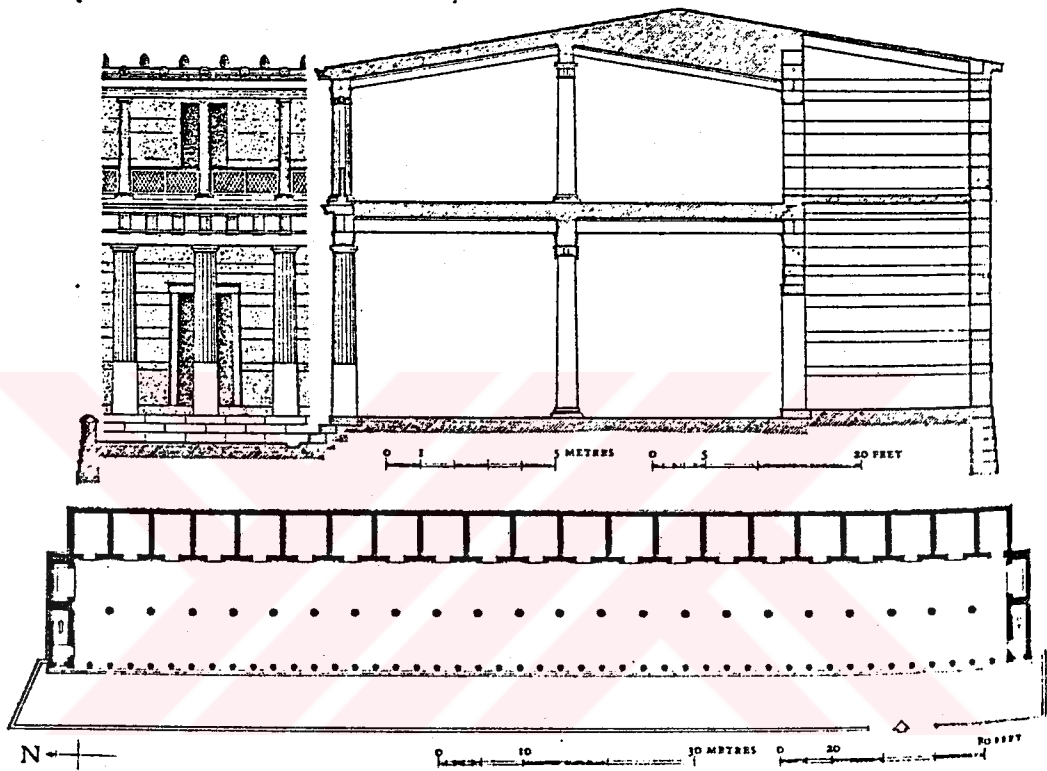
Restored Elevation, section and the plan of Stoa of Attalos, Athens (A.W. Lawrence, Greek Architecture)
